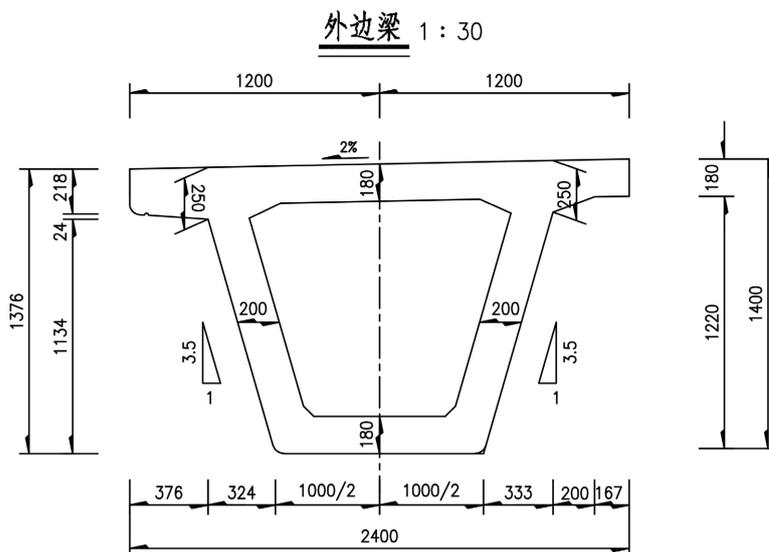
Cross-sectional drawing of exterior beam for 25 m span precast box girder
